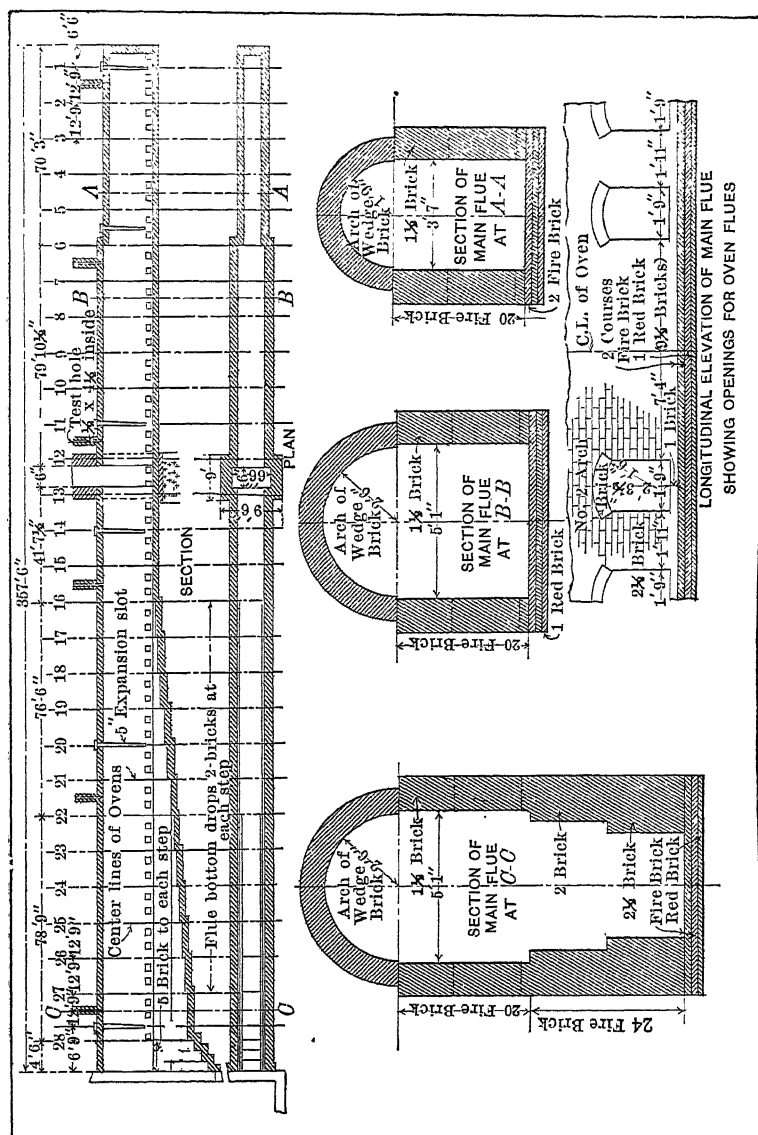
ELEVATION, PLAN, AND SECTIONS OF MAIN FLUE FOR BLOCK OF 56 OVENS.
